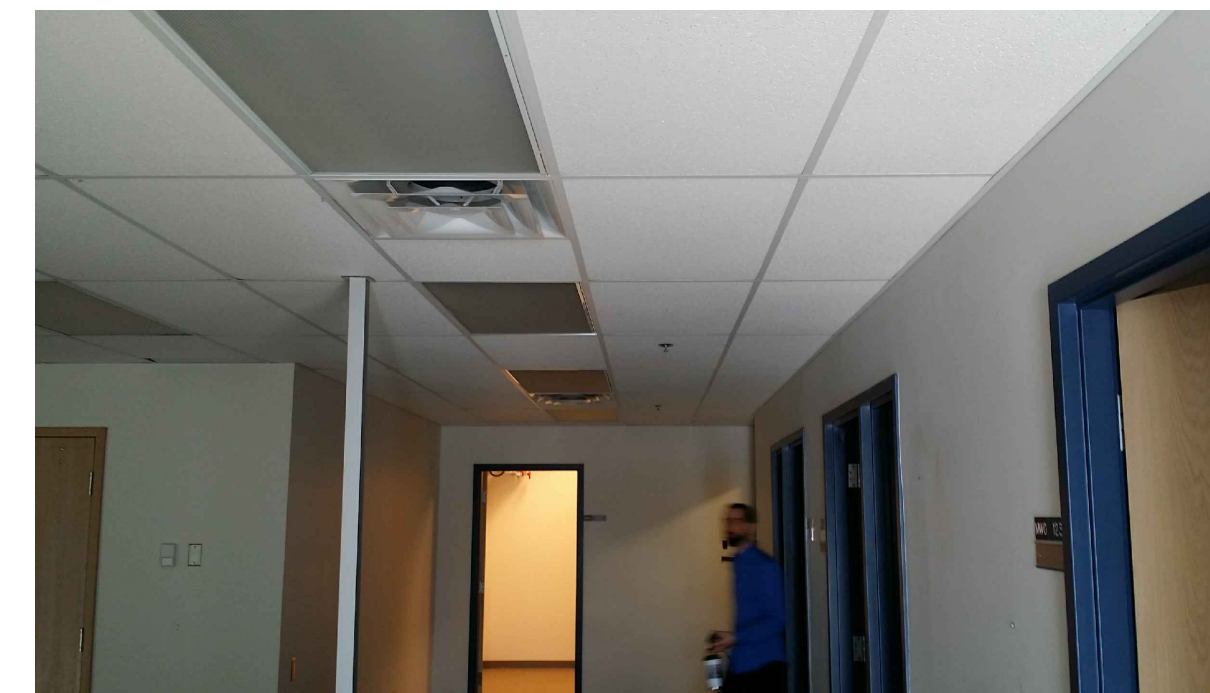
VIEW OF CEILING AT DOORS TO ROOMS W124 AND W125
